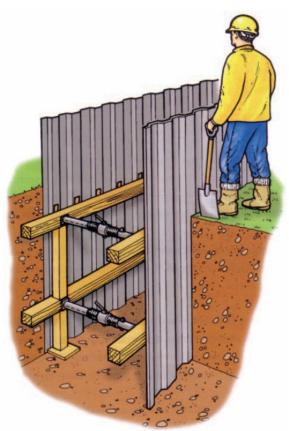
Trench sheets with timber walings, screw props, puncheons and sole plates (Hughes, et al., 2008). Timber packing should be used to prevent struts bearing directly on steel.
